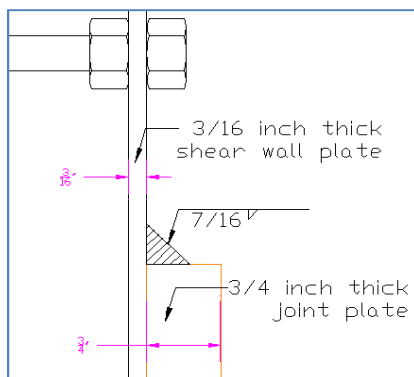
Weld Joint 1 - A 7/16-in. Fillet weld between wall specimen plates and the foundation connection plates
